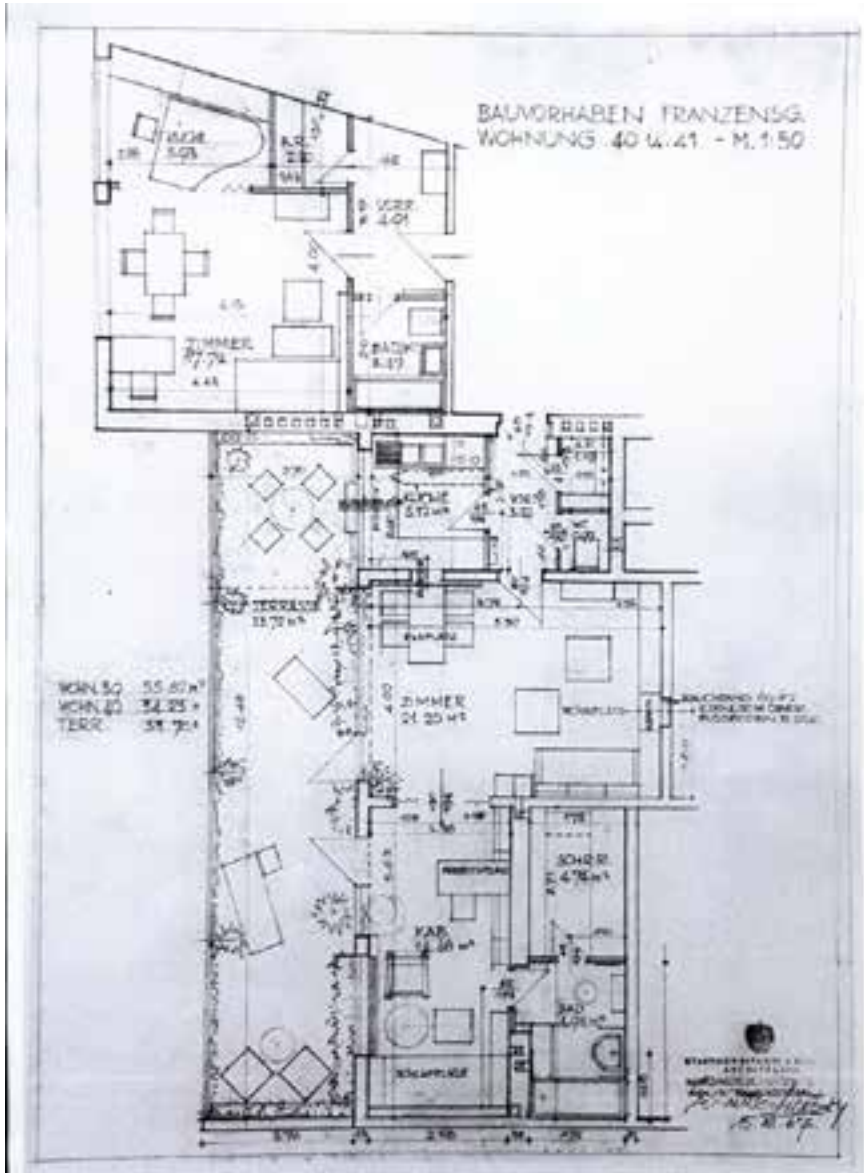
Floorplan of the apartment and the neighbouring small flat in 16 Franzensgasse, Vienna; pencil drawing by Margarete Schütte-Lihotzky, dated 15.12.1967, © University of Applied Arts Vienna (UaK), NL MSL, Inv.Nr 201/1
